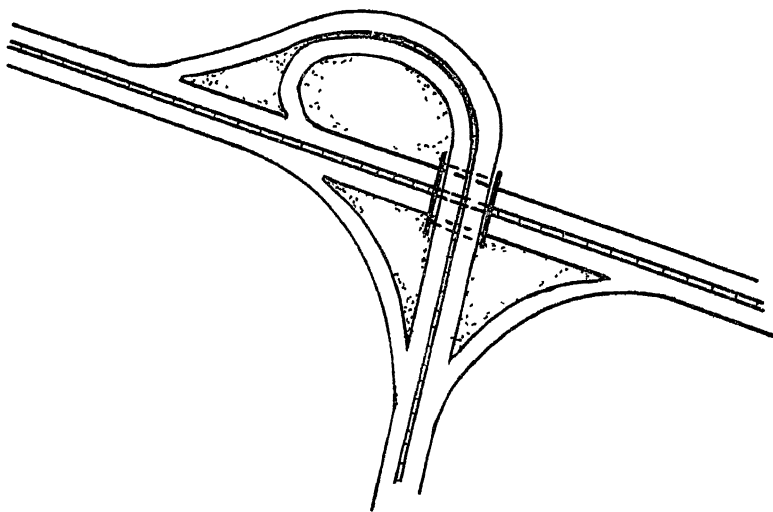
(a).—"TRUMPET" TYPE OF GRADE INTERSECTION (U.S. PRACTICE).
